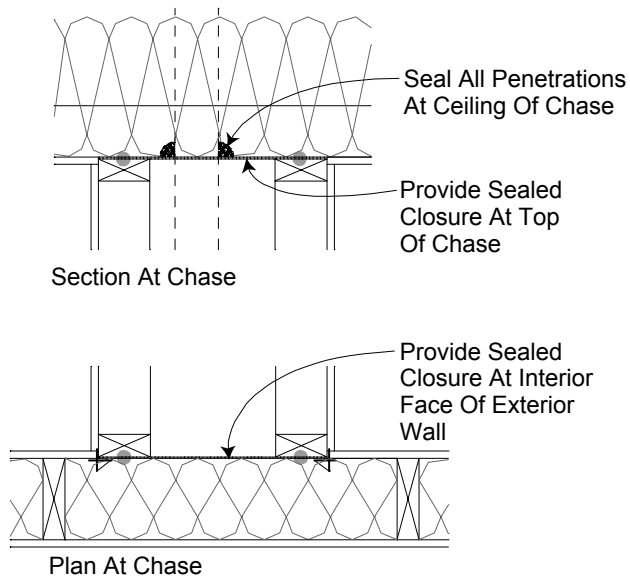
Draft stops: Upper drawing shows draft stop where chase meets attic and pipe continues into attic; Lower drawing shows draft stopping where chase meets exterior wall.
